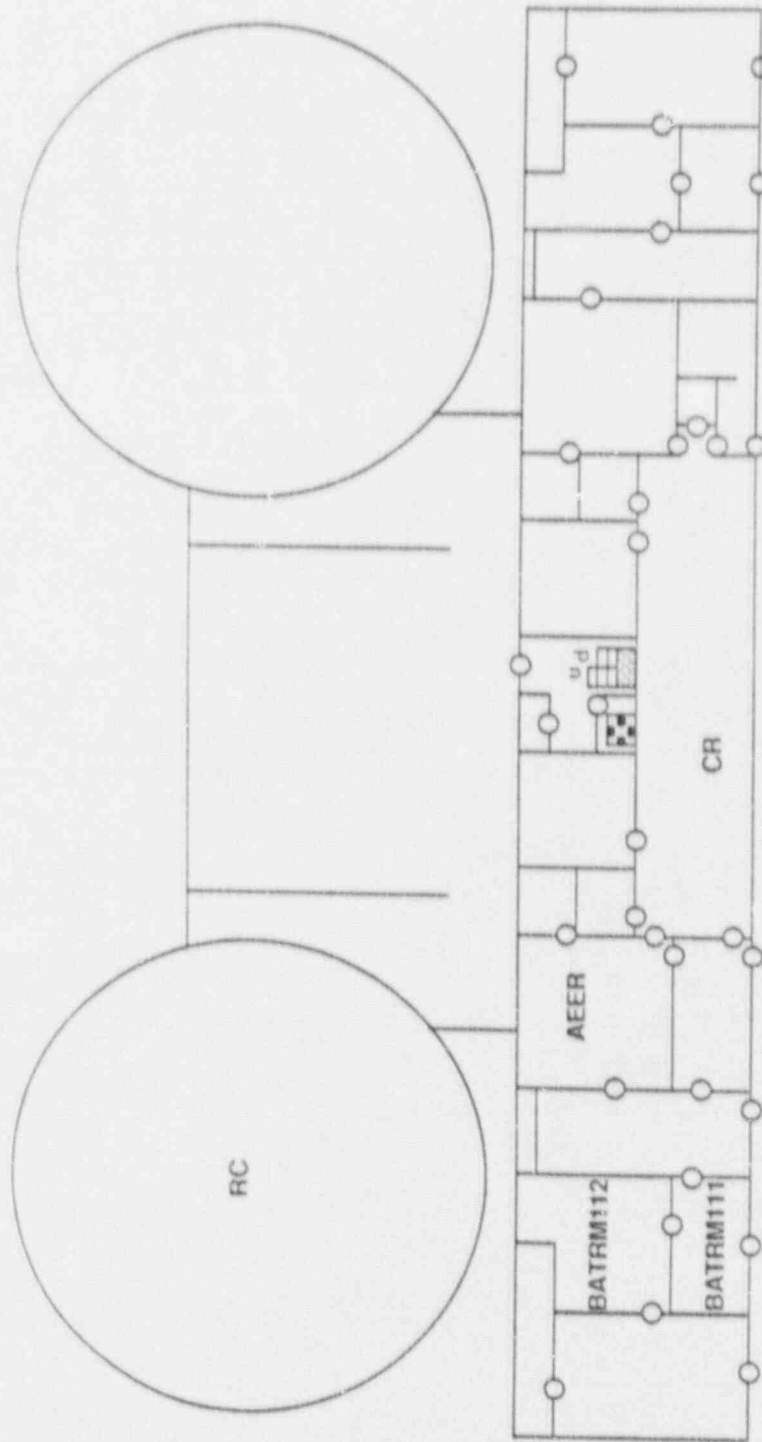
Braidwood 1 & 2 Station Arrangement, Elevation 451'
